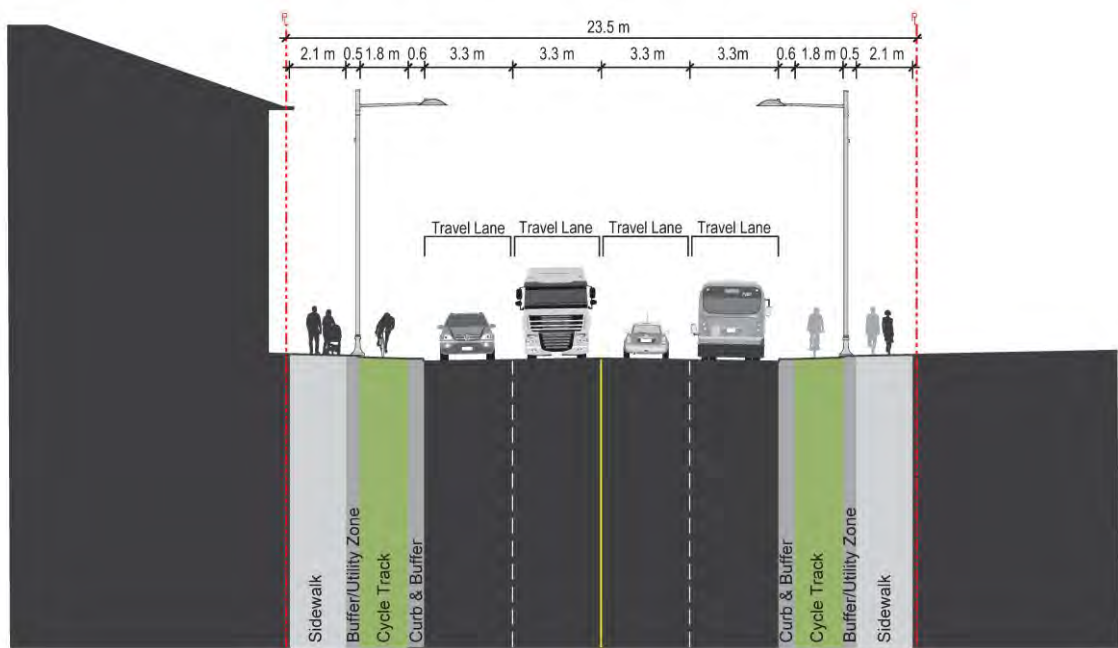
Typical Section at 96 Laird Drive (Ultimate Cross-Section)
